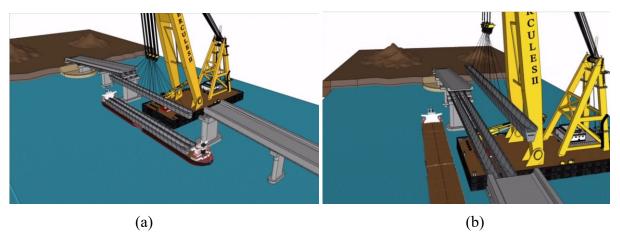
(a) 120 m span U girders assembled on barge and (b) lifting using barge crane.
